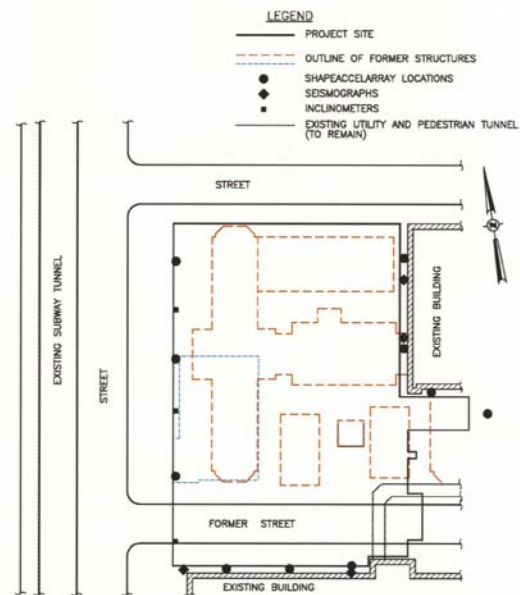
Schematic of Site Dimensions, Adjacent Structures, Infrastructure and Instrumentation.
